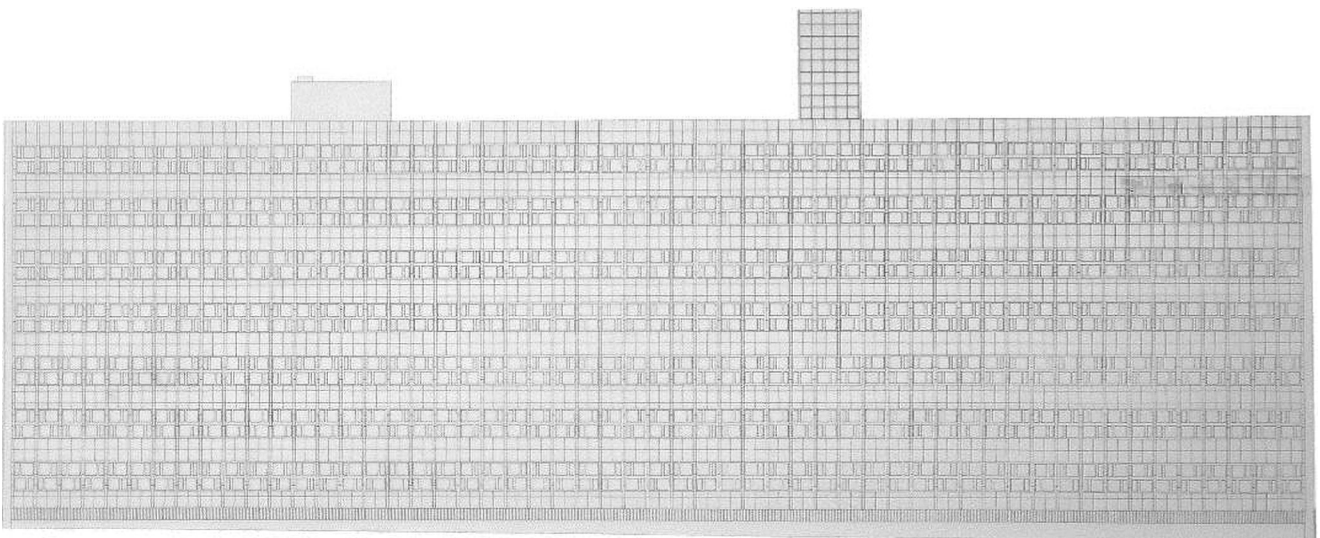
Western façade of Large Building at 6 Pierottijeva Street (original Albini's drawing). Source: Faculty of Food Technology and Biotechnology, University of Zagreb
